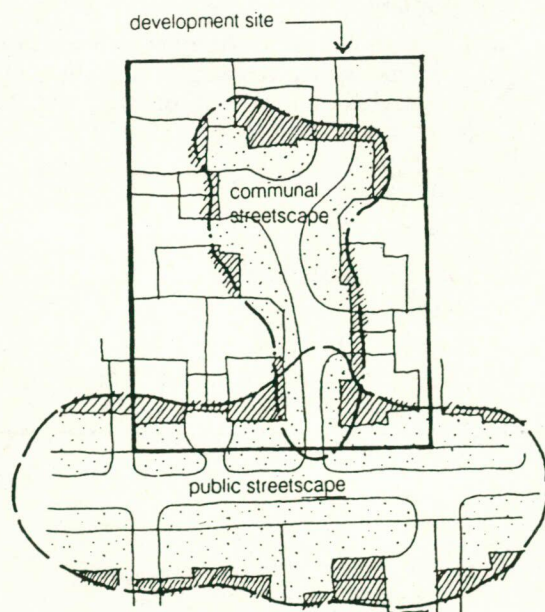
STREETScapeS MAY BE CATEGORISED AS PUBLIC OR COMMUNAL WITH COMMUNAL STREETScapeS BEING INTERNAL TO THE SITE
